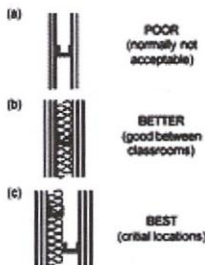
Gypsum Board Wall Constructions in order of least to most sound isolating (a) 1 layer gypsum wall board (GWB) each side (b) 2 layers GWB, glass fiber insulation, 2 layers GWB (c) 2 layers GWB, 2 sets of studs, glass fiber insulation, 2 layers GWB
